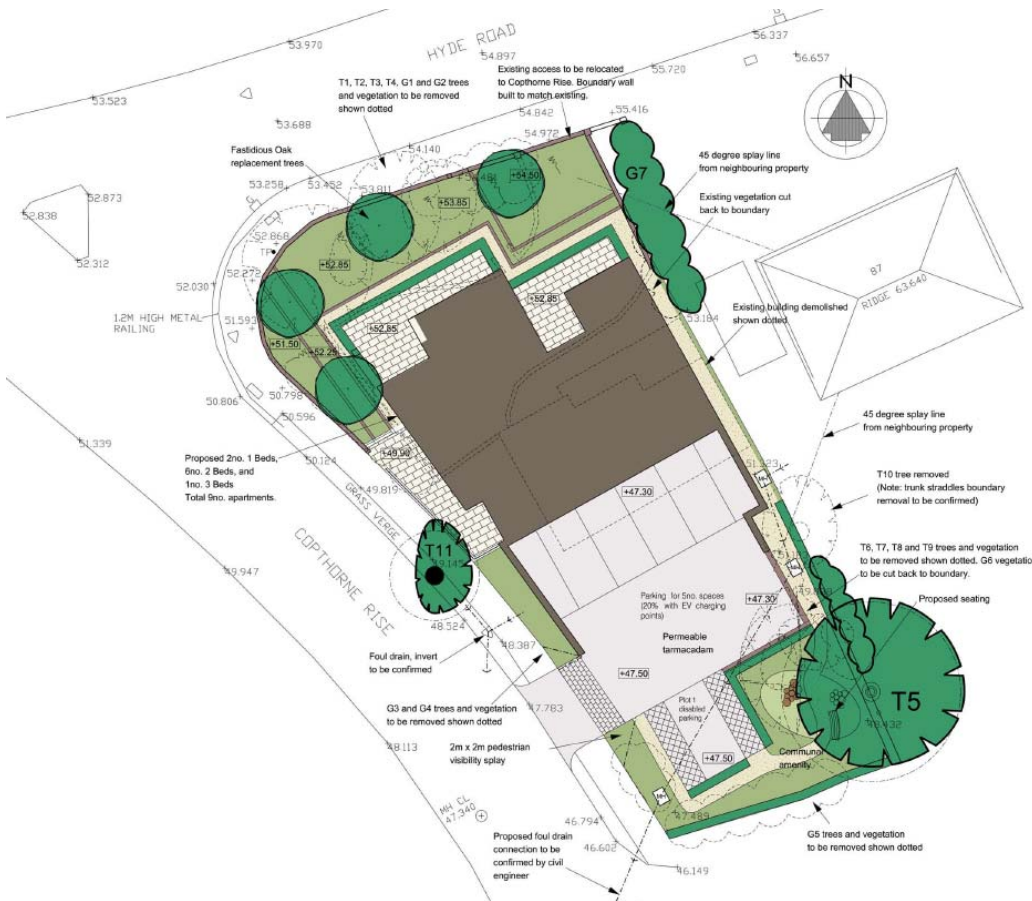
Site Plan – Ariel Perspective (Lower Ground Floor Plan)
